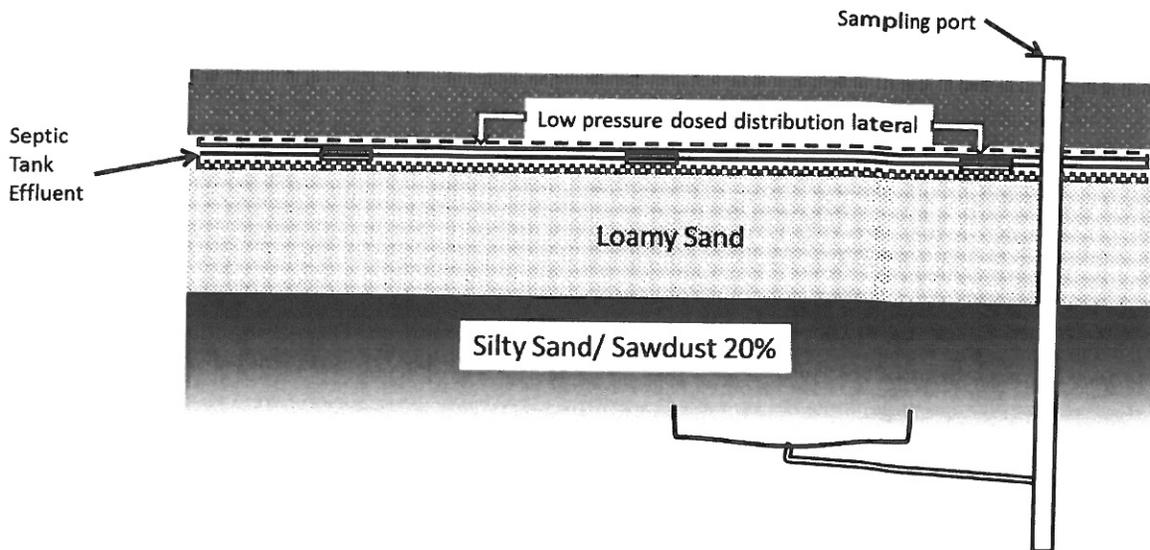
Schemata showing section of full-scale sand-silt-sawdust system installed at the Massachusetts Alternative Septic System Test Center in June 2015. Area was completely contained for representative sampling (containment not shown).
